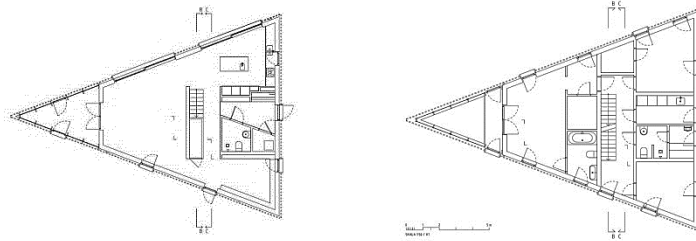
Garden House - Tham & Videgård Arkitekter (<http://housevariety.blogspot.pt/2010/11/garden-house-by-tham-videgard.html#.UYE0uaJwqM0>).
